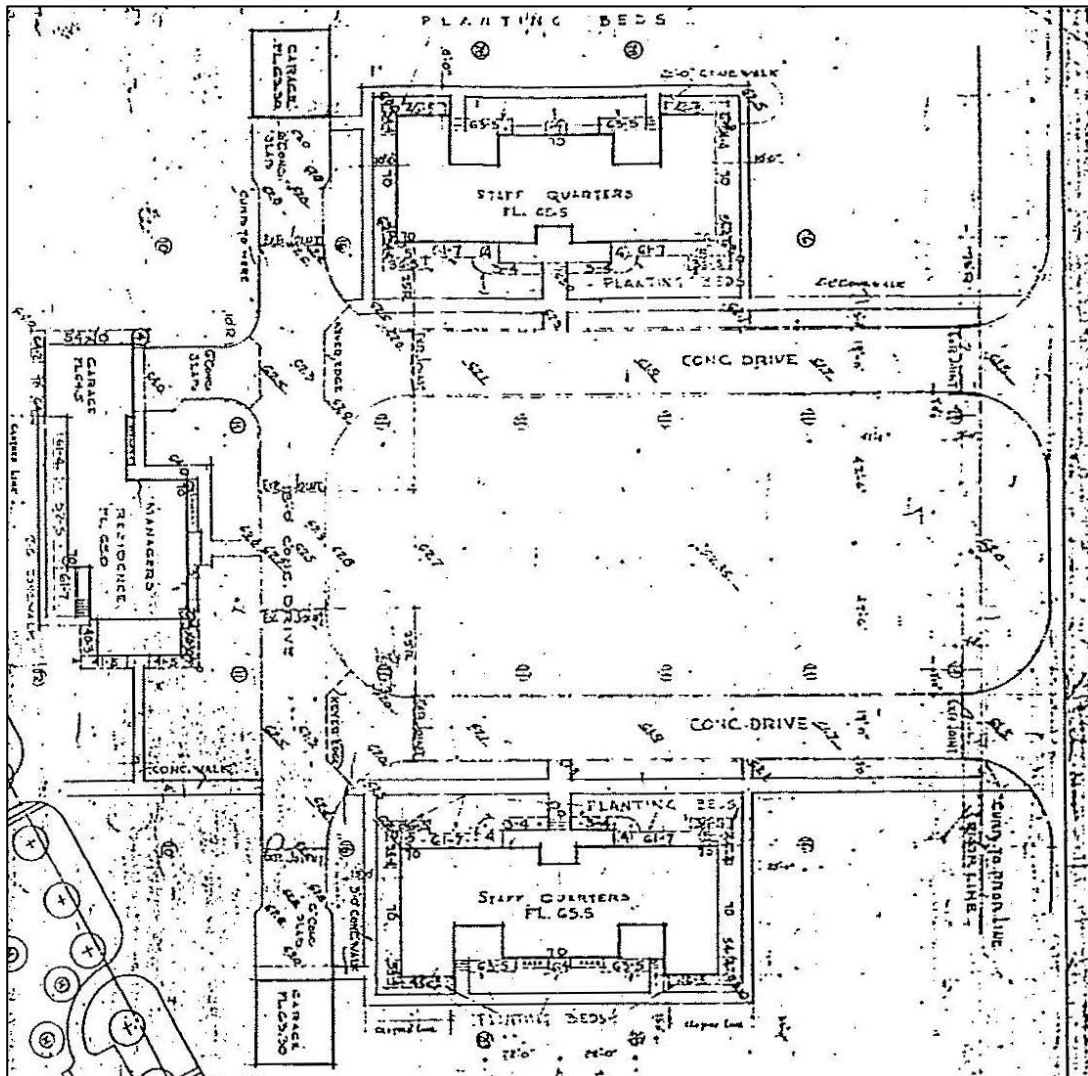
Detail from planting plan prepared for the site in 1950 to show the cul-de-sac of staff housing located northeast of the main hospital (VA). Note: Building #3 is to the north of the drive (i.e., top of drawing), Building #4 to the south and Building #2 (the manager's quarters) is to the west.
